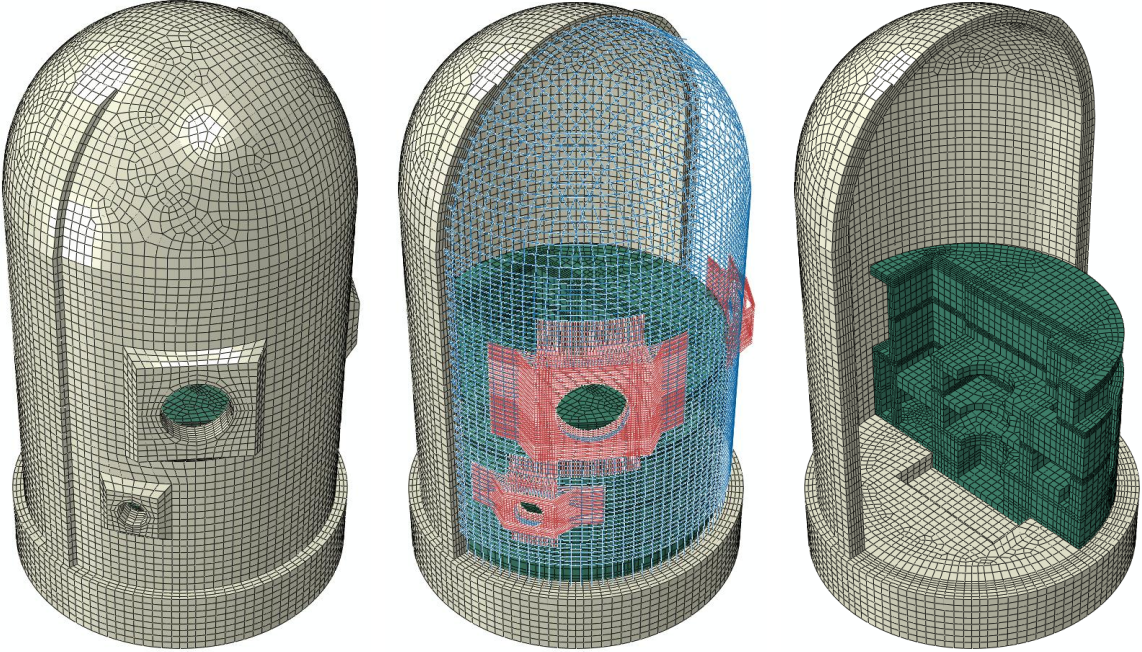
Finite element model of internal concrete structure and reactor containment building
